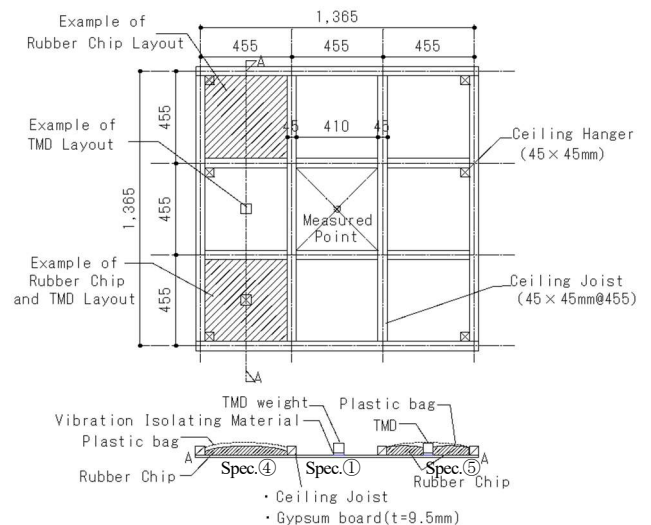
Plan and Cross-section View of the Ceiling Model and Example Layout of Granular Materials and TMD
